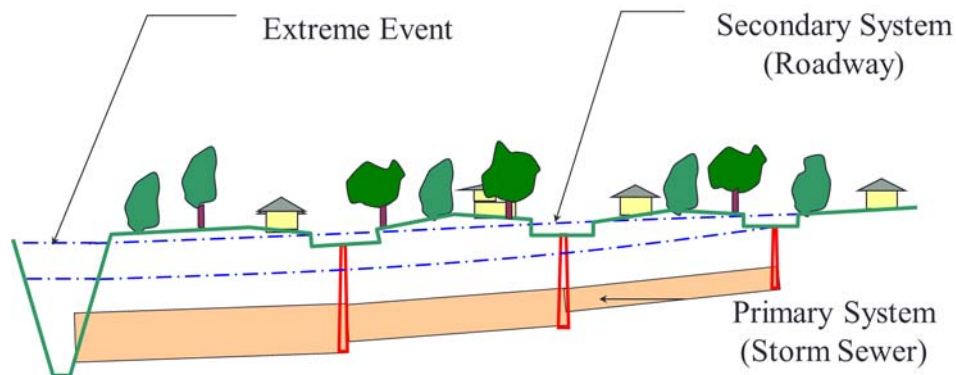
Drainage Systems (Storm Sewer and Roadway)
